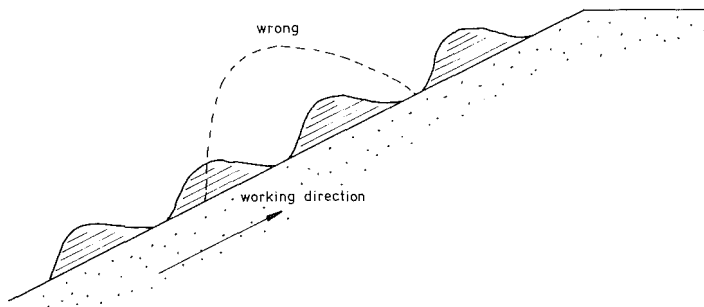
Asphaltic concrete brought onto the slope in small heaps, working upwards.
